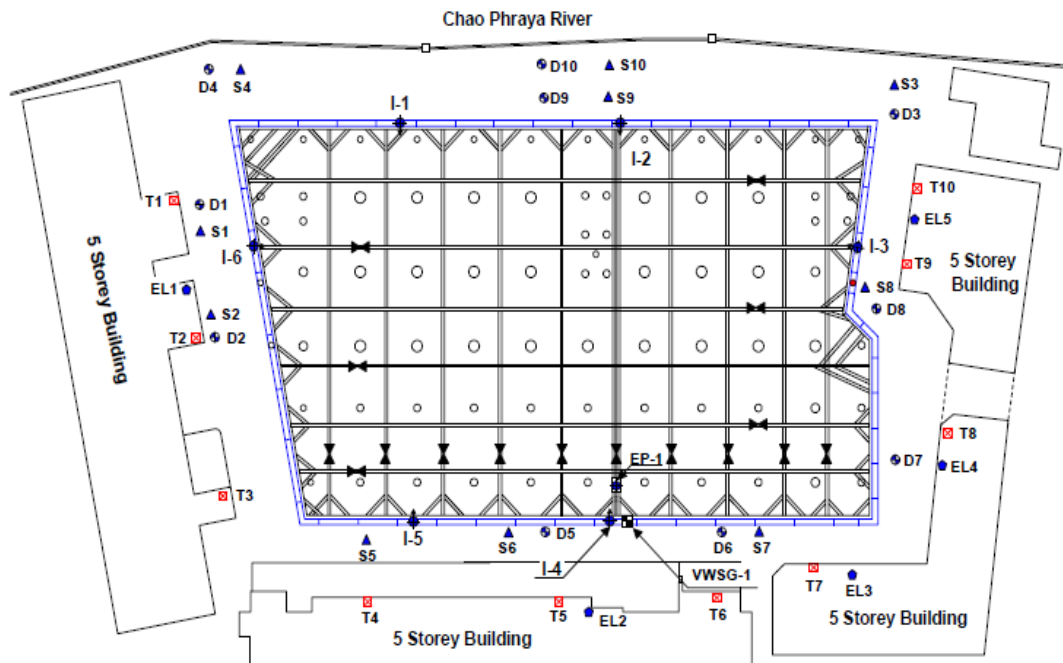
Layout of temporary bracing and instrumentation.[after Thasnanipan et al., 1999]
